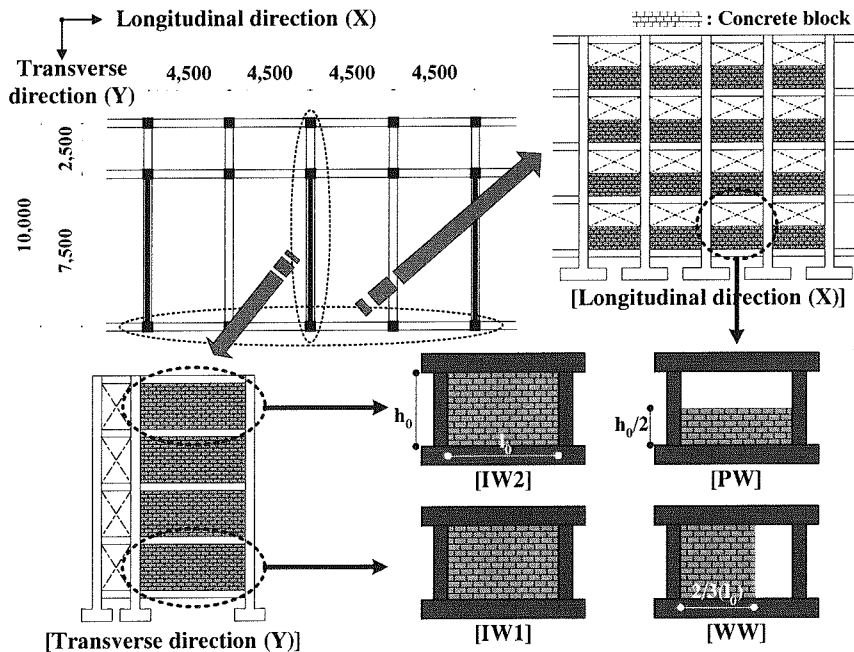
Standard design of Korean school buildings in the 1980s and specimen configuration
